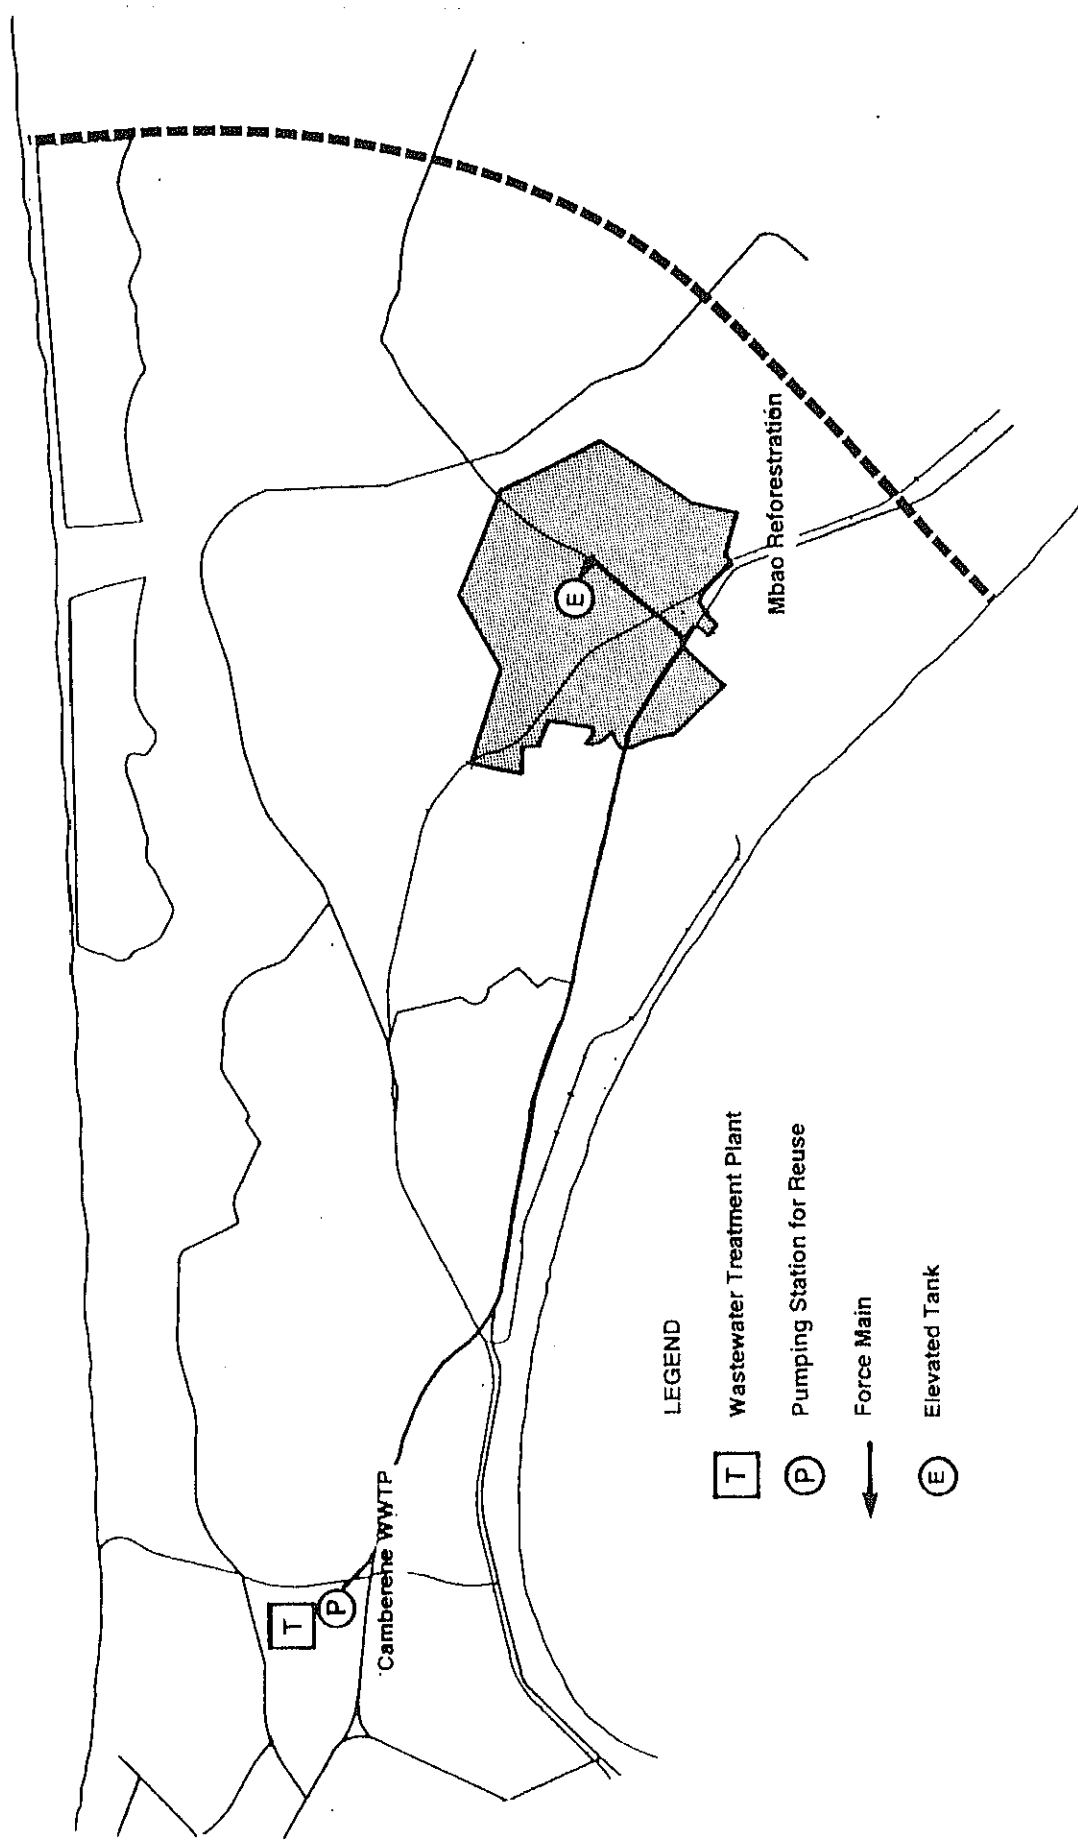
FACILITY PLAN OF REUSE (IRRIGATION)
